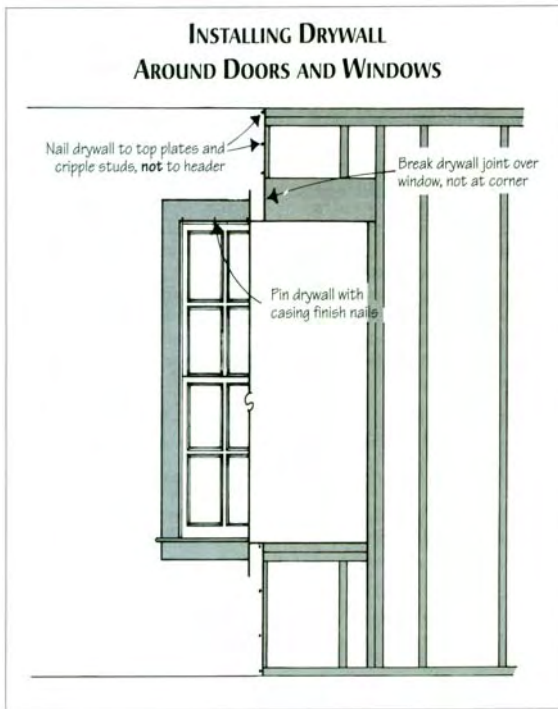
To prevent drywall joints from cracking at the corners of windows and doors, place the sheet so the joint falls in the center of the opening, and then cut out the waste. Also, do not fasten the drywall to the header, but use the interior casing to secure the loose edge of the drywall.
